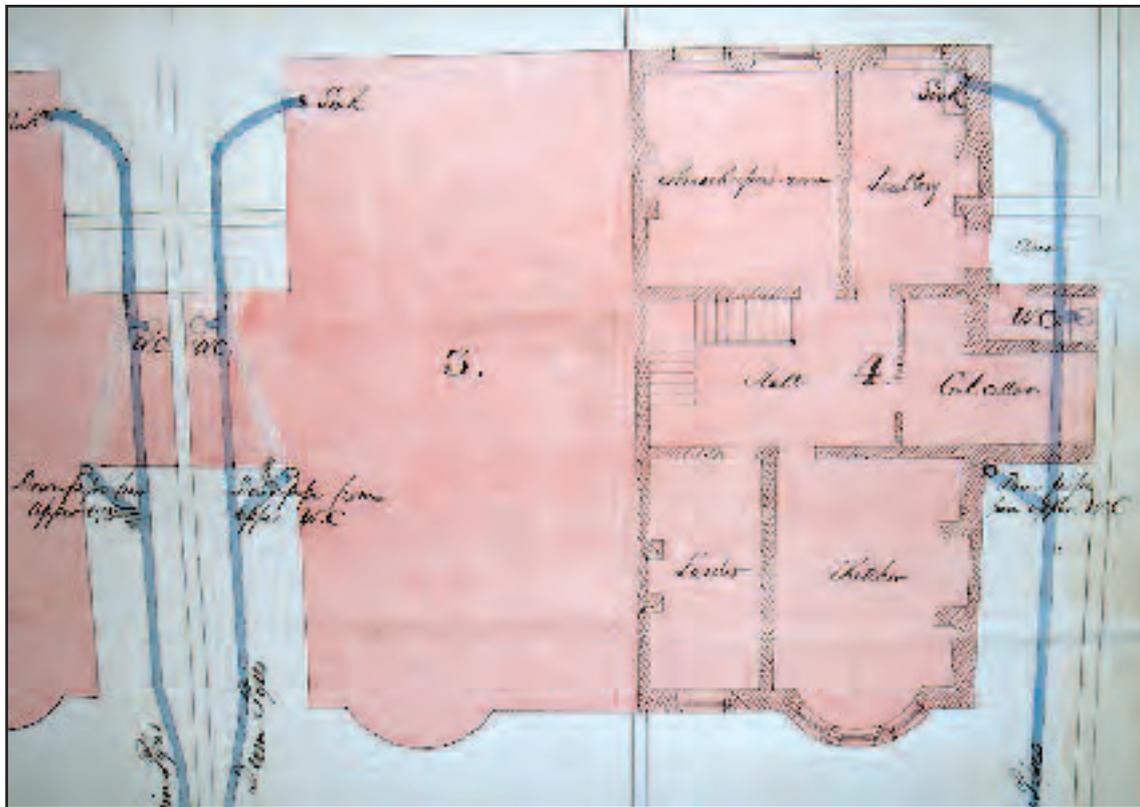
Basement plan of 7 & 9 Woodland Road, 1861
